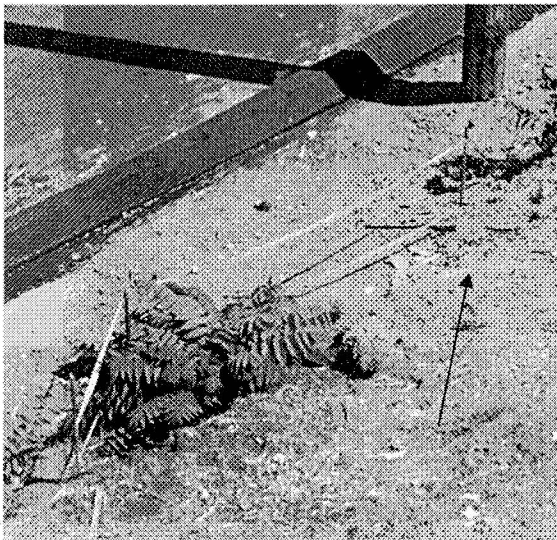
Previously known brick conduit (19-003103) adjacent to project area
